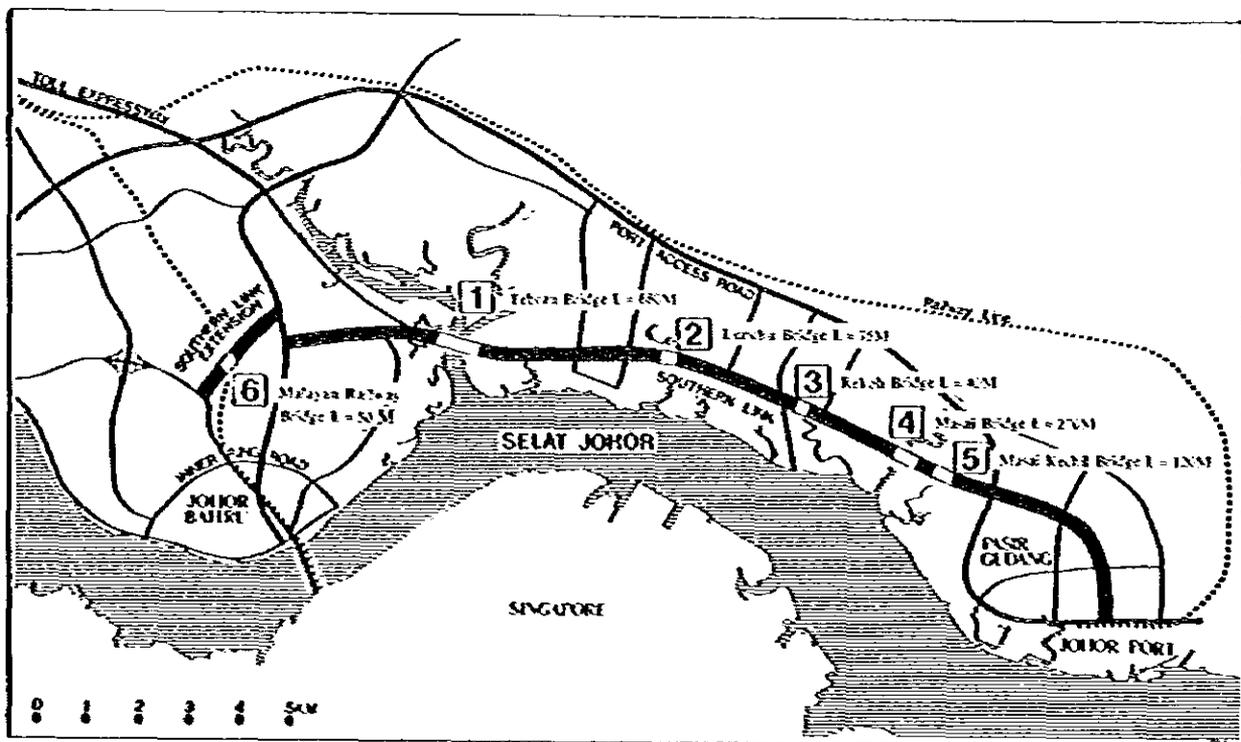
BRIDGE PLAN ON SOUTHERN LINK AND ITS EXTENSION
